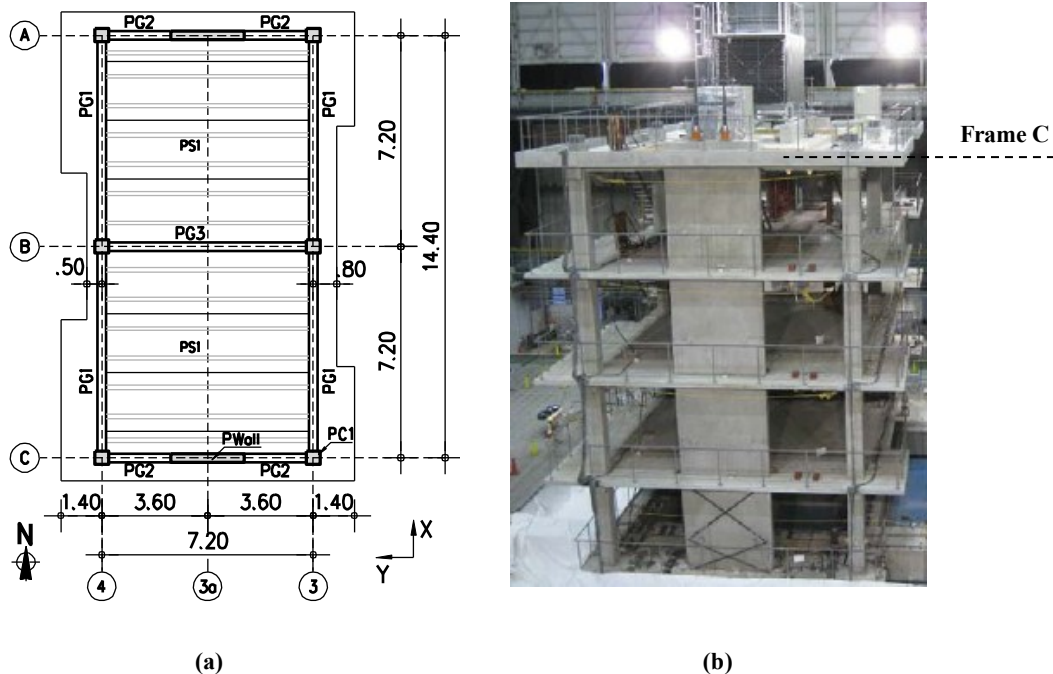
(a) Typical framing plan of PT building; (b) view of Frame C of PT building on shake table
